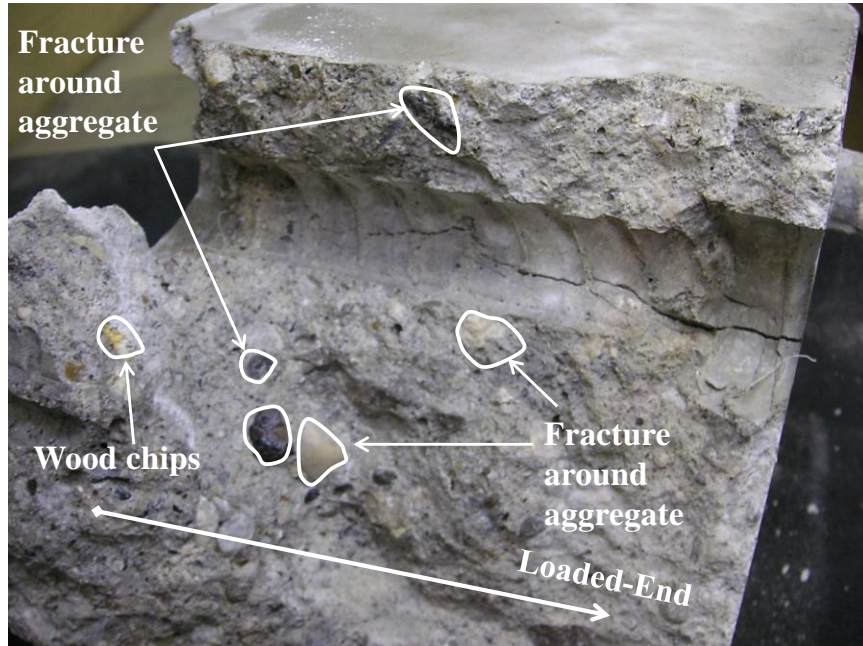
Main failure planes through concrete cover (dissected BE-RAC2-30-125B)
